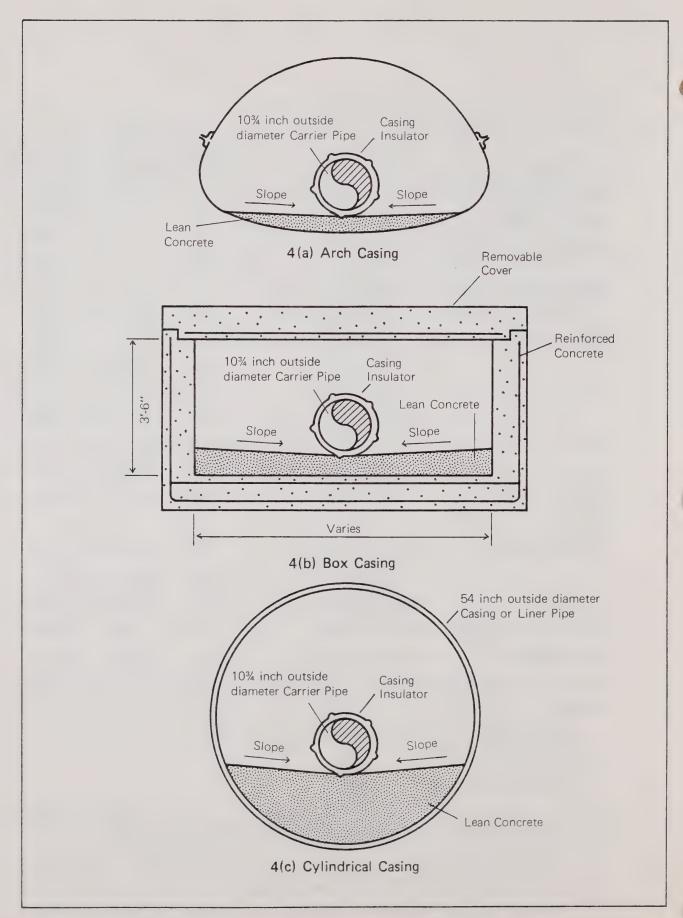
CROSS SECTIONAL VIEWS OF TYPICAL CASING DESIGNS AFTER INSTALLATION
